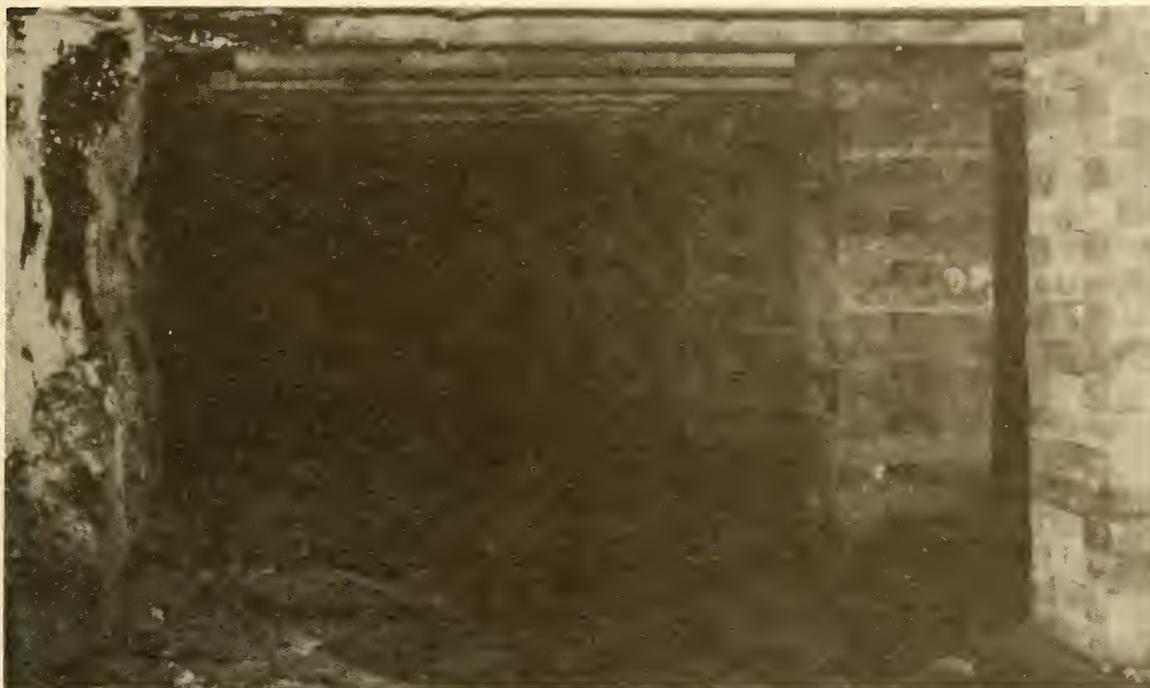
Longwall tailgate entry with single row of concrete cribbing. West Virginia mine.
